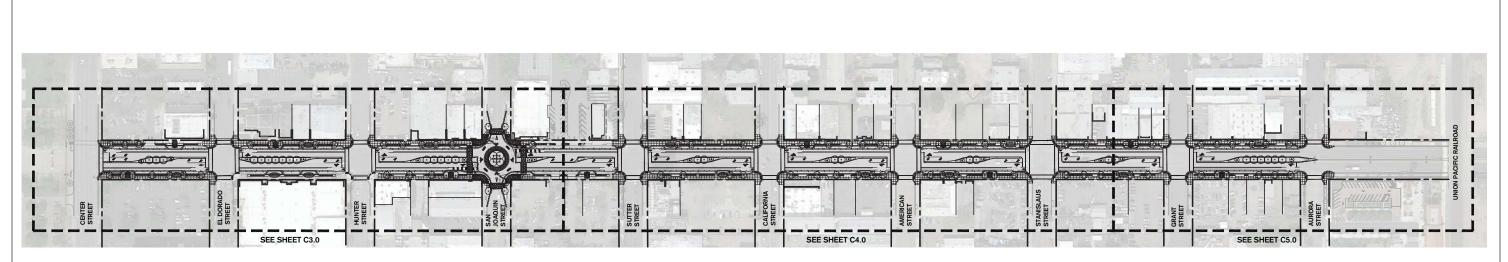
illustrates the access restrictions, including driveway removals, proposed by the Precise Road Plan. The Precise Road Plan preference is for automobile access to properties occur from the side streets, where possible, to limit the potential conflicts with pedestrians, bicyclists, and public transit along the Miner Avenue Corridor. The proposed approach to access control follows.
